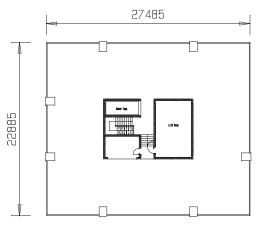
Rooftop Floor Plan (Scale 1:500)
